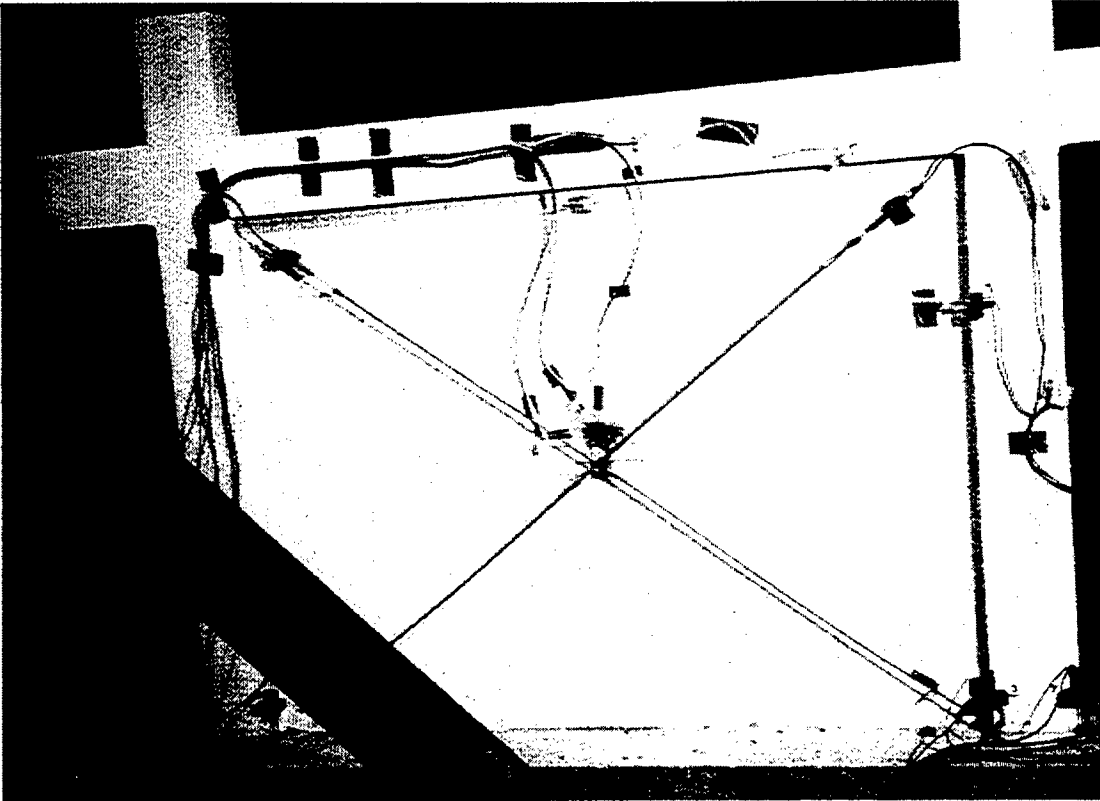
Model 3, Single-Bay Brick-Infilled Specimen At Early Loading
